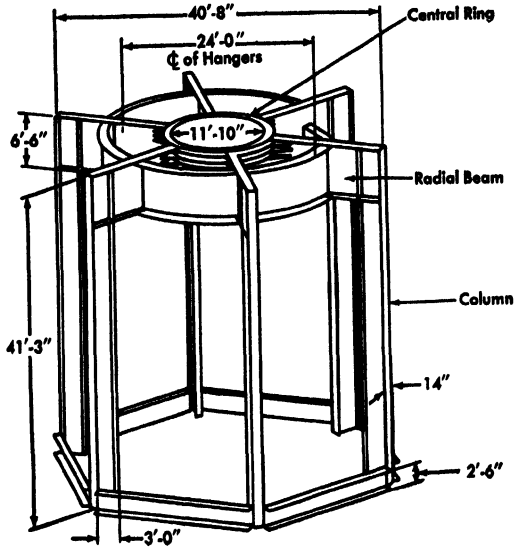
Schematic drawing of the EBR-II primary tank support structure.
